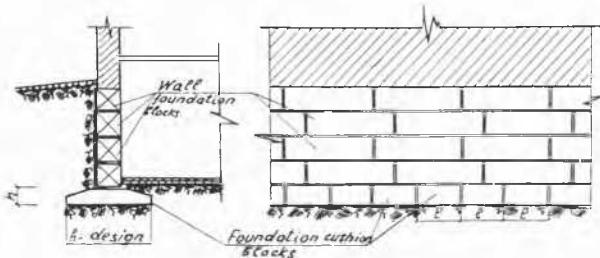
a Precast strip foundations with solid concrete wall blocks.
